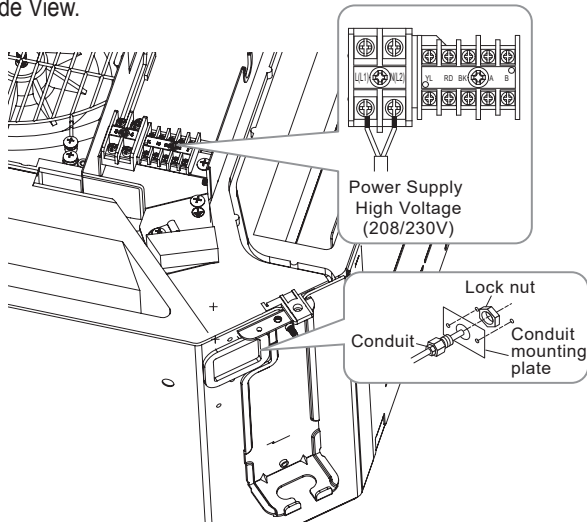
TA Frame Four-Way Cassette Wiring / Cable Routing, Side View.
